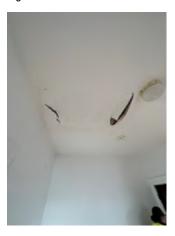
Peeled Paint and Cracked Sheetrock on the Ceiling from Water Damage.
